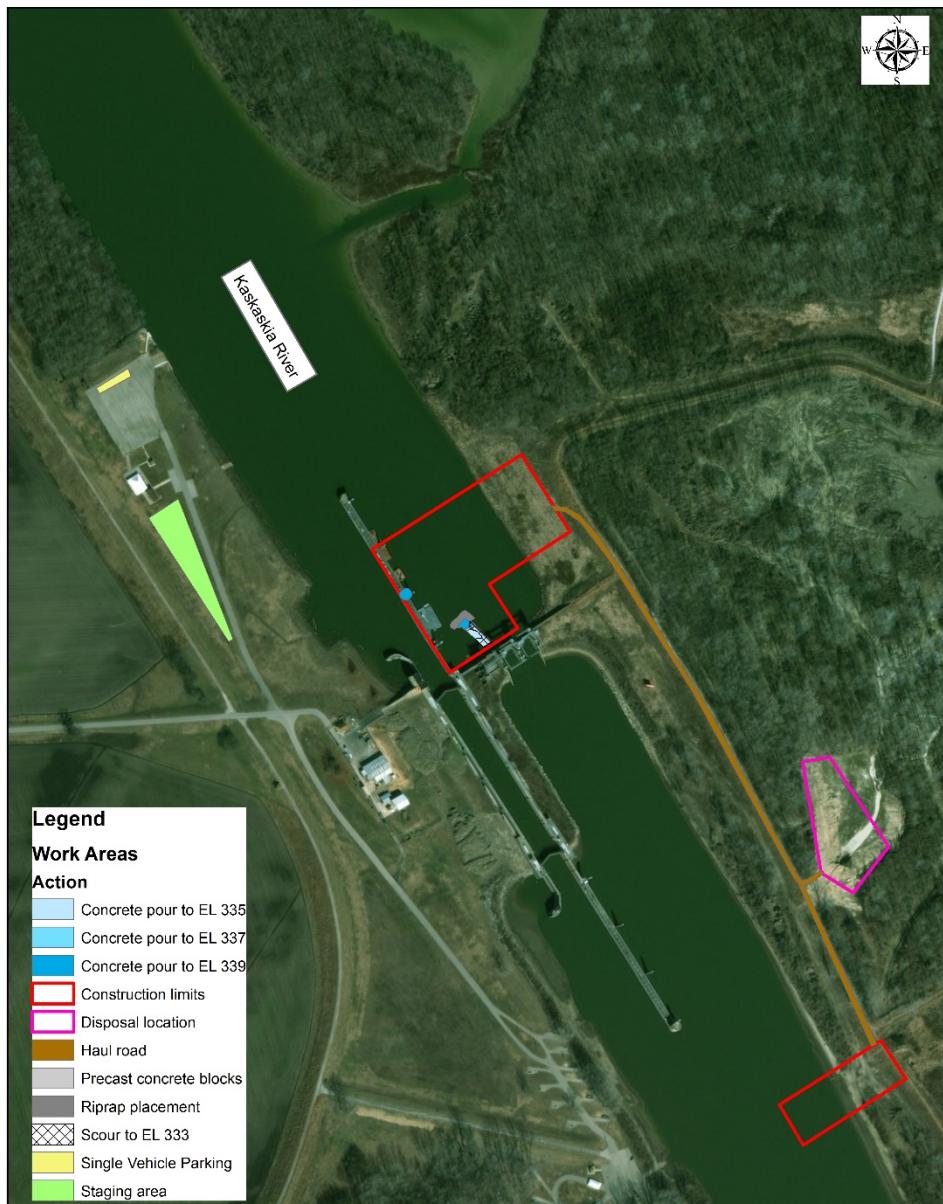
All work areas involved in the proposed plan to repair scour holes.
